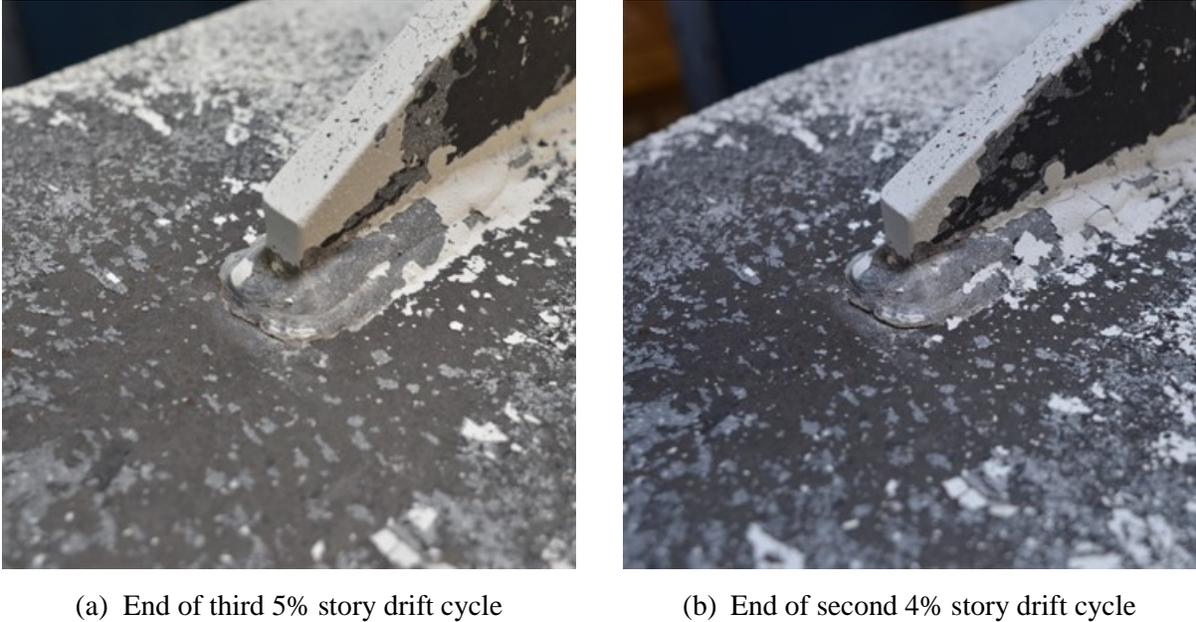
Top flange fracture initiation and propagation 8ES-1.375-1.5-36wrap
